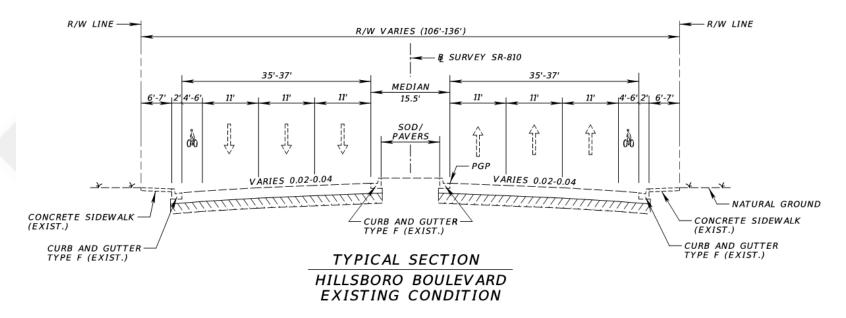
Existing Typical Section – Hillsboro Boulevard
